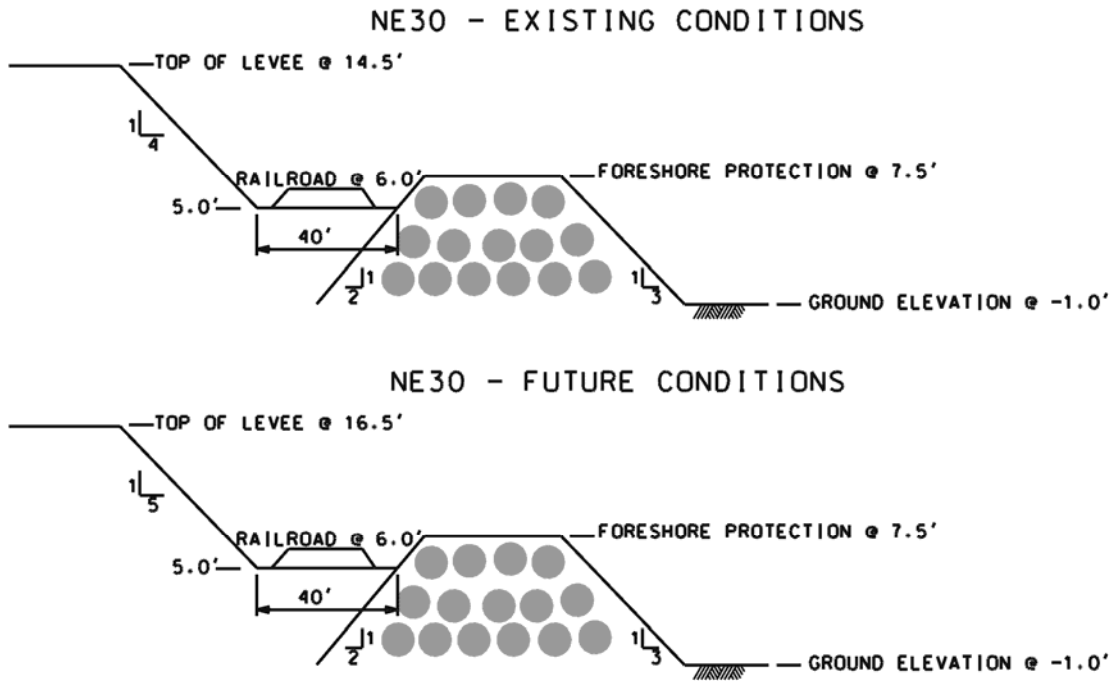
Cross-section profile for transition levee between Citrus Lakefront Levee and New Orleans East Lakefront Levee (NE30) for existing (upper panel) and future conditions (lower panel).
